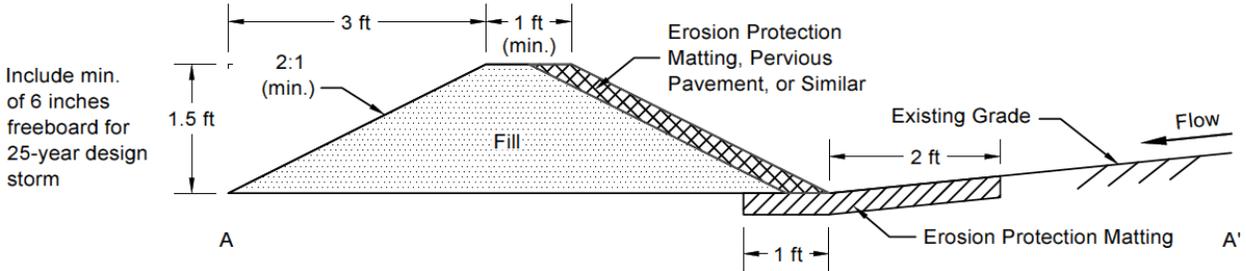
Proposed Diversion Berm Concept Design Cross-Section A – A'
